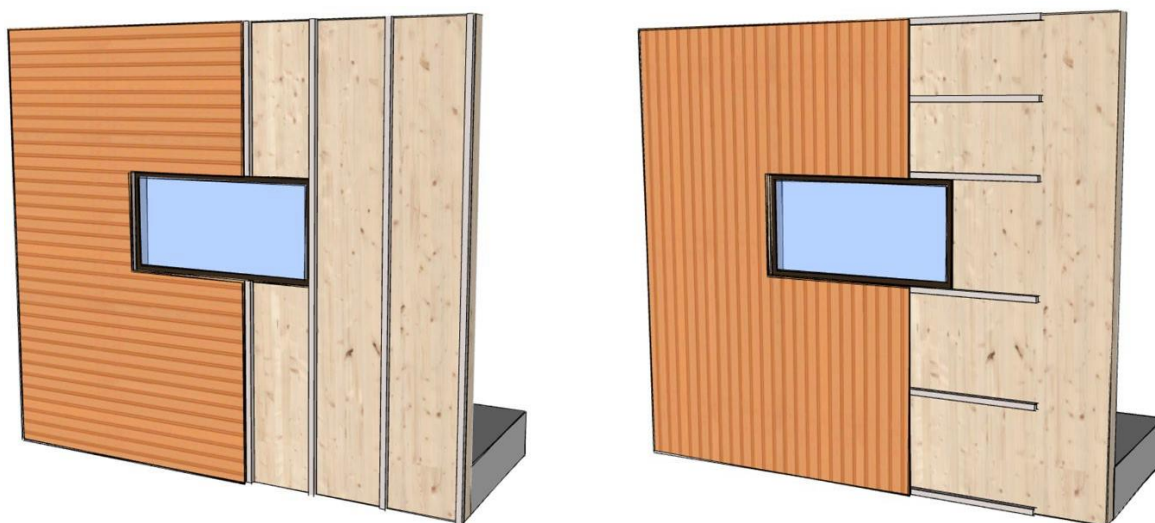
Spacer battens used over a structural masonry or CLT substrate
